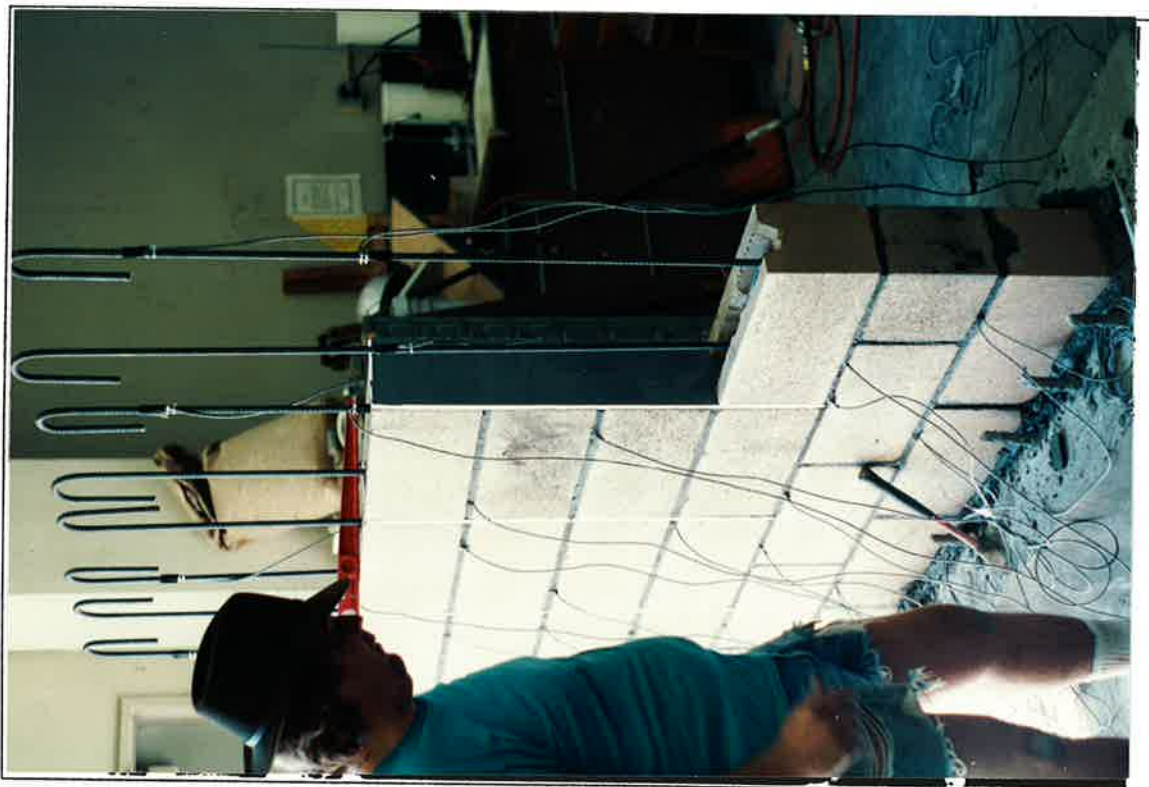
Construction of Final Pier In Slitted Portion of Wall
